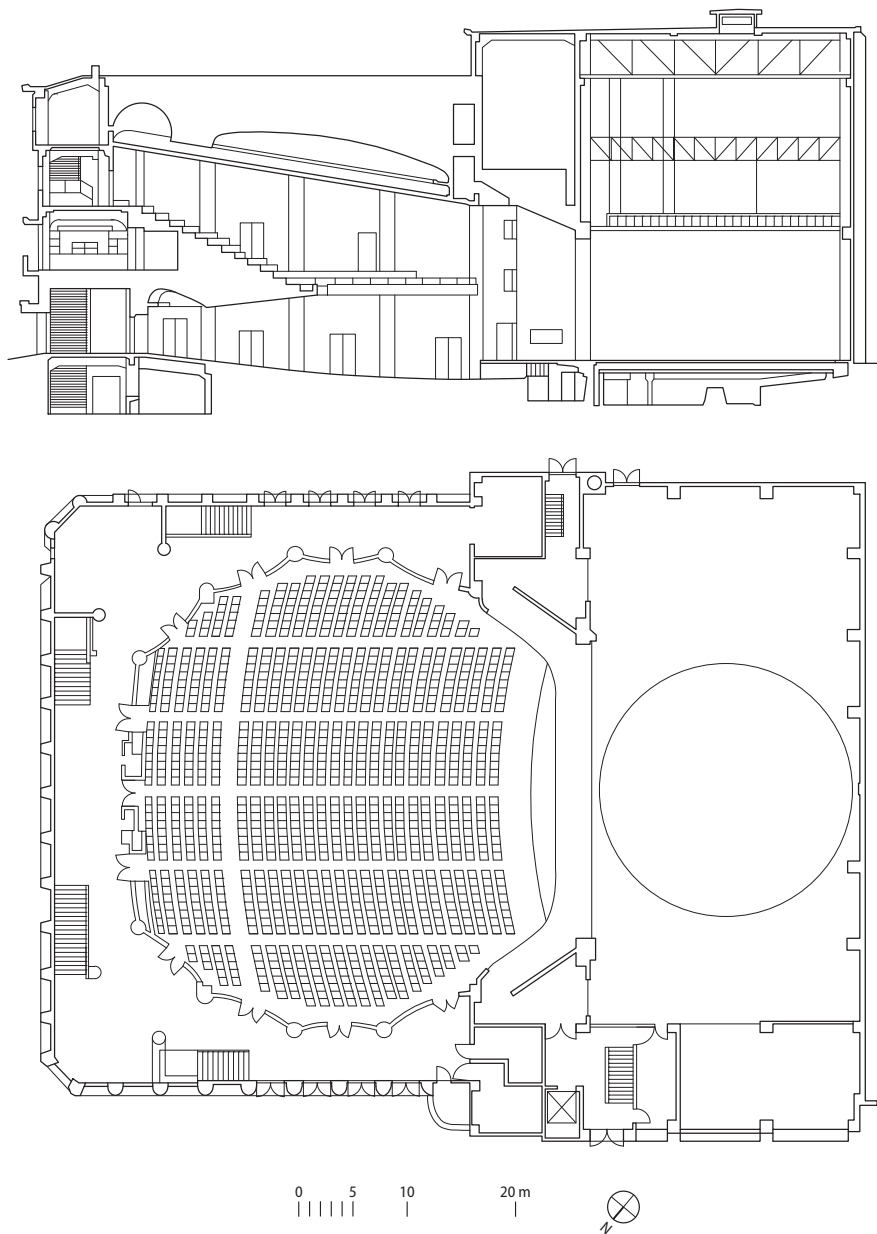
Longitudinal section (top) and floor plan (bottom) of the Yuraku-za, opened in 1935, Scale = 1:700
